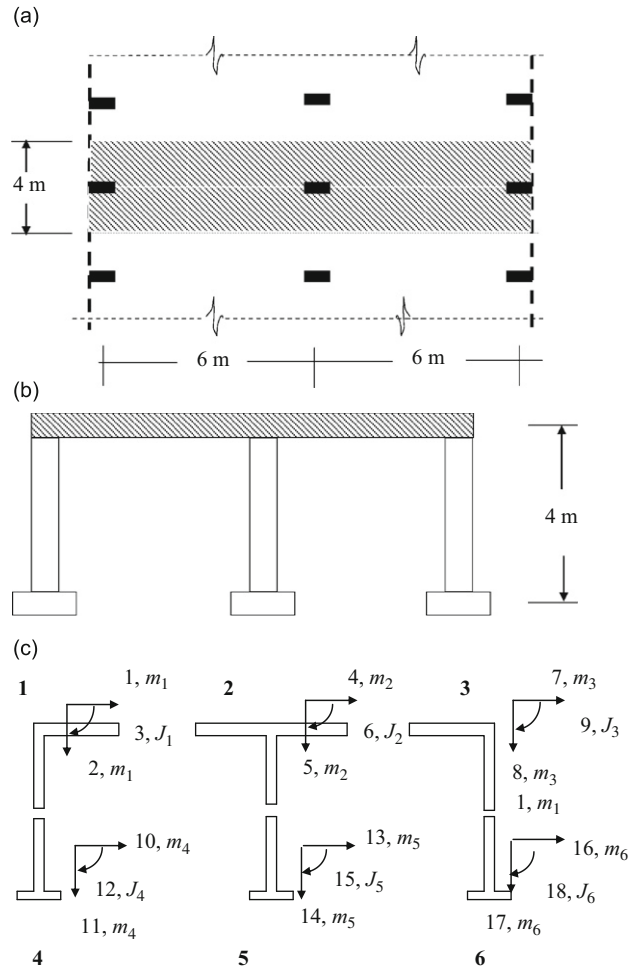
Typical open-plane frame on isolated footings: (a) plan, (b) transverse section and (c) mass discretization.
